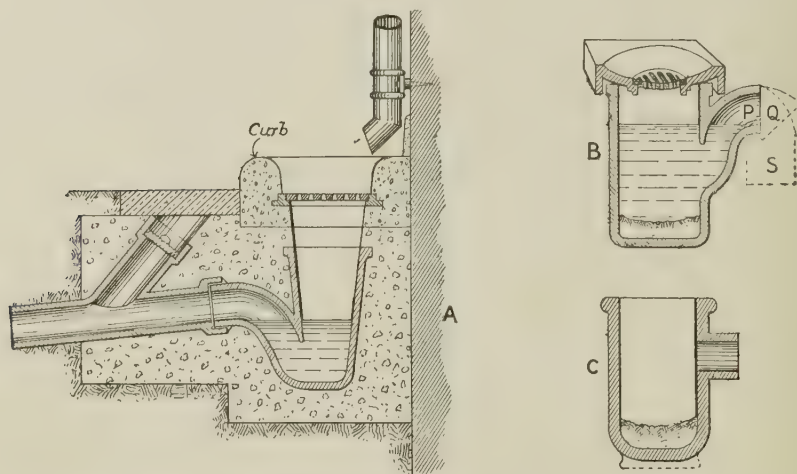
Gullies. A, Trapped Gully, with Cleaning Arm and Stopper, and Concrete Curb; B, Trapped Silt Gully; C, Trapless Silt Gully
